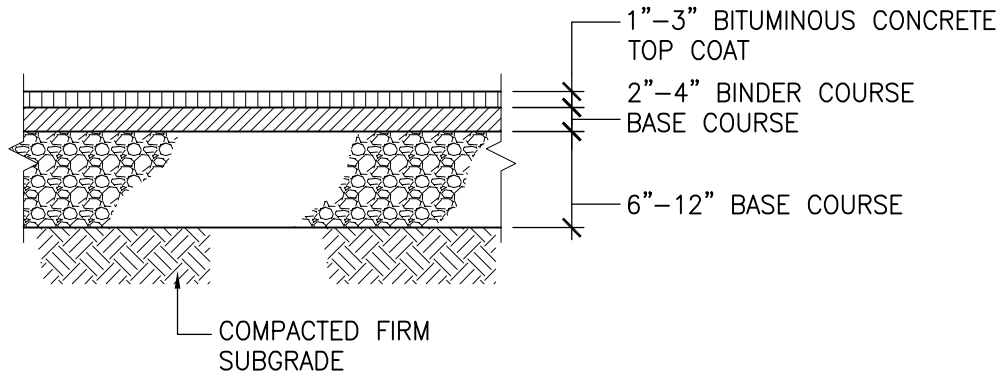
ASPHALT CONCRETE PAVEMENT DETAIL
